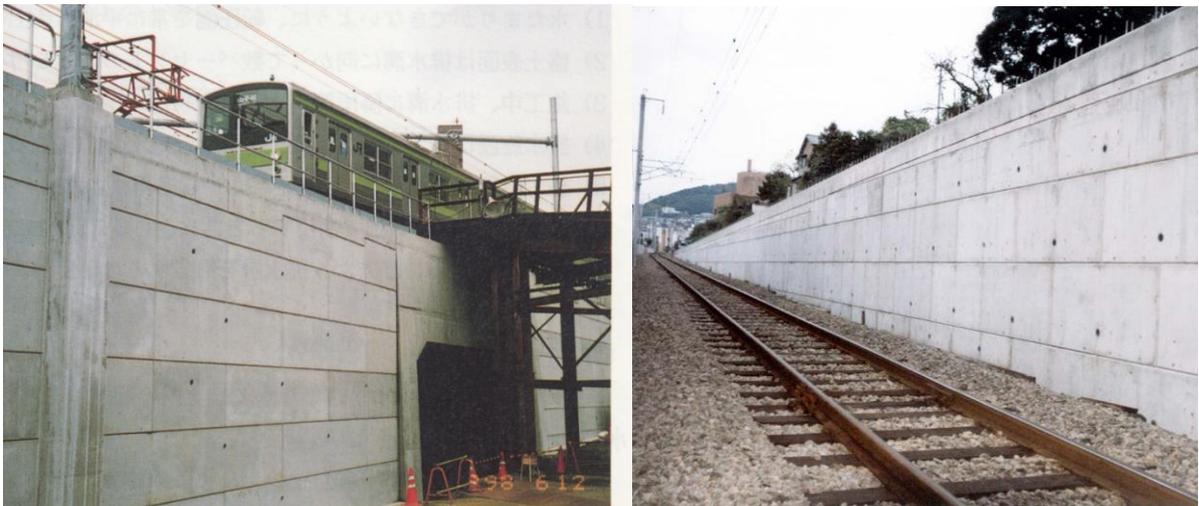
GRS RW constructed by using RRR-panel
